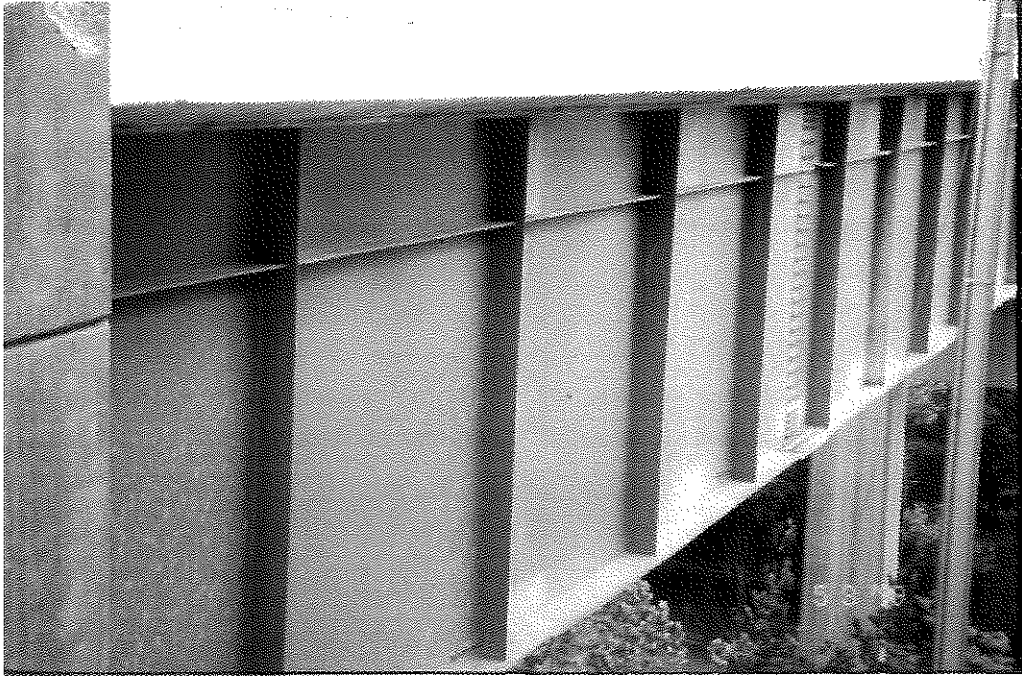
PAINT DAMAGED BY FALLING CONCRETE.
